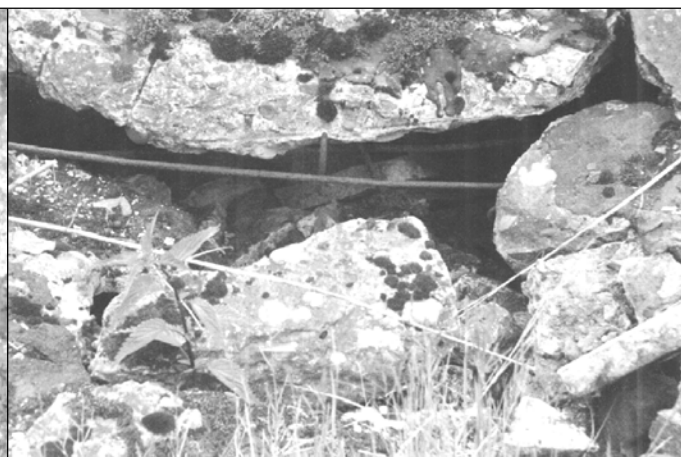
Concrete roof of morgue 1 of crematorium II in Birkenau. Provan's opening no. 6 in June 1990.
